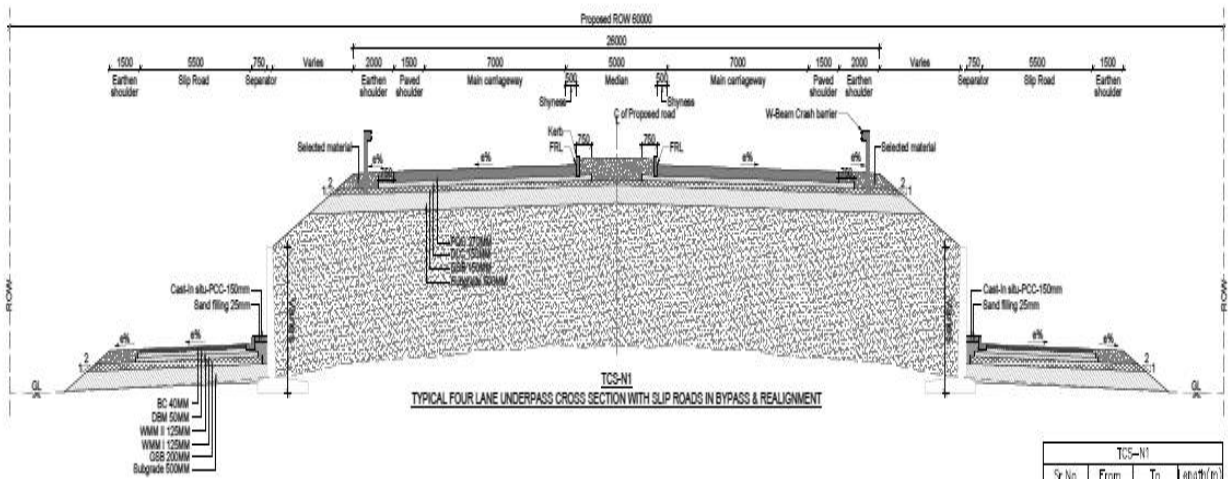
TCS-N1 Typical Four Lane Underpass Cross Section with Slip Roads in Bypass & Realignment
